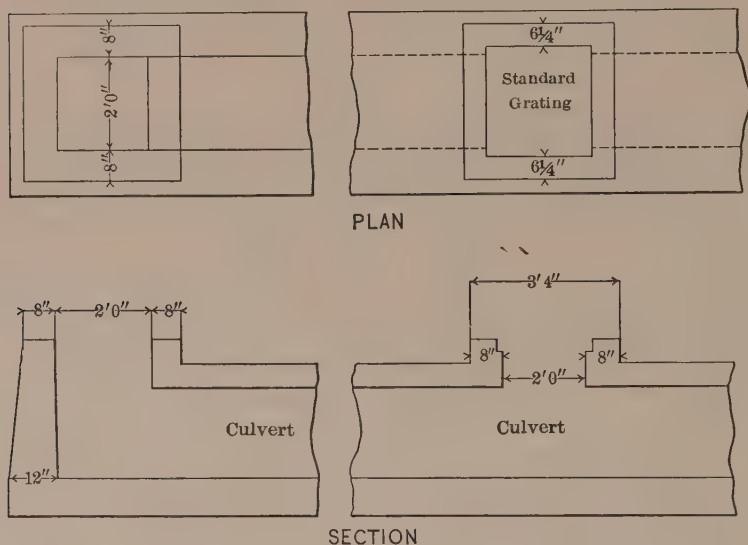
Concrete Box Inlet. New York State Highway Department.
